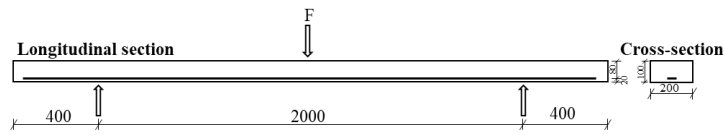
Shallow S-C1-9 beam test setup and dimensions (units in mm)
